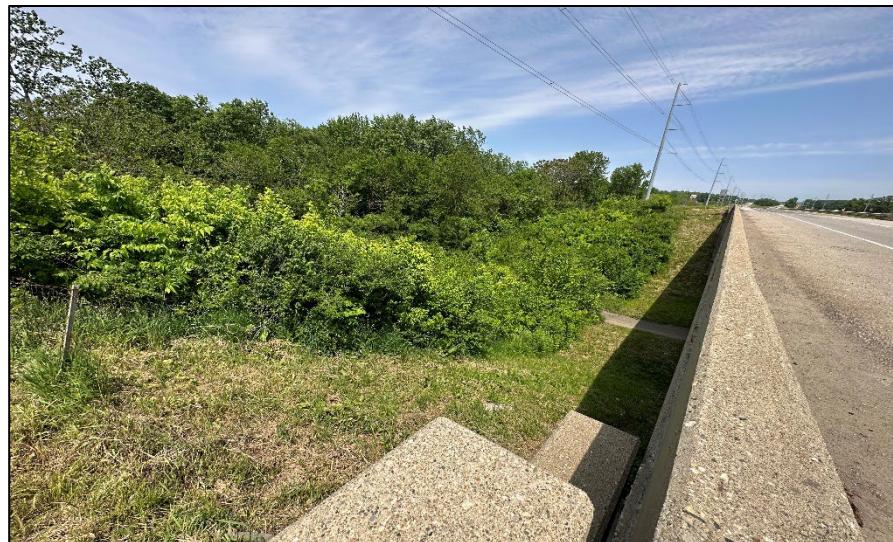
Facing northwest from the southbound bridge toward the right-of-way.
